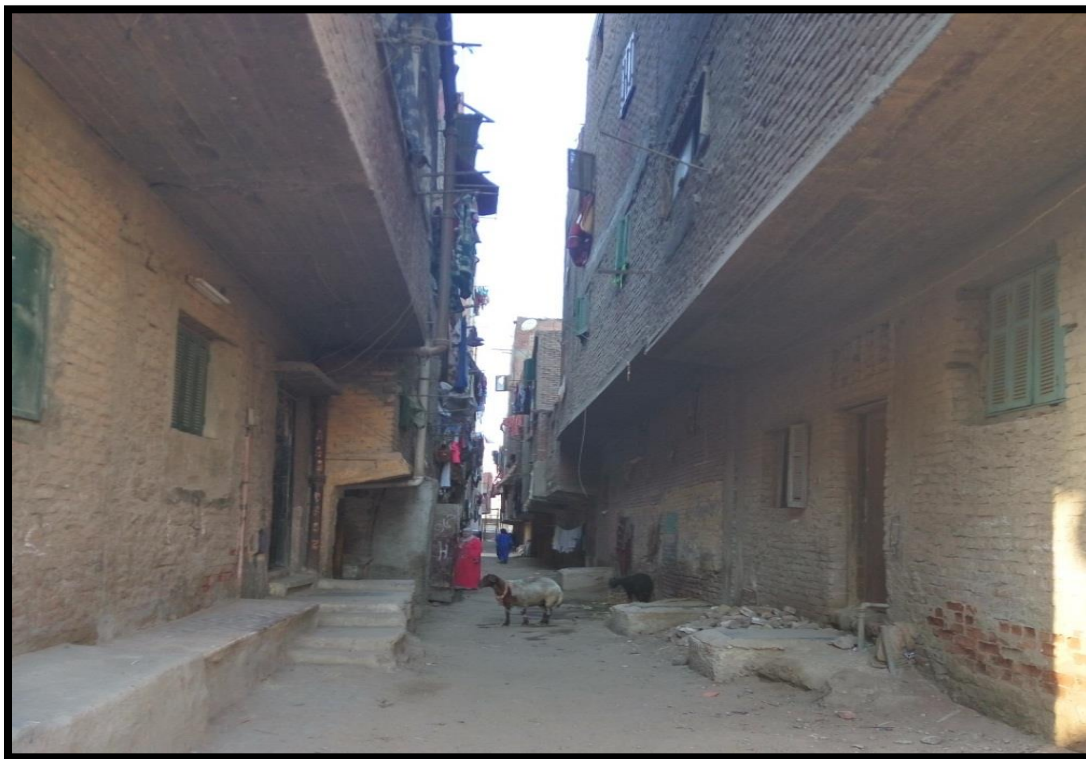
Dwellings constructed of concrete and red bricks in Izbet Afandena village
